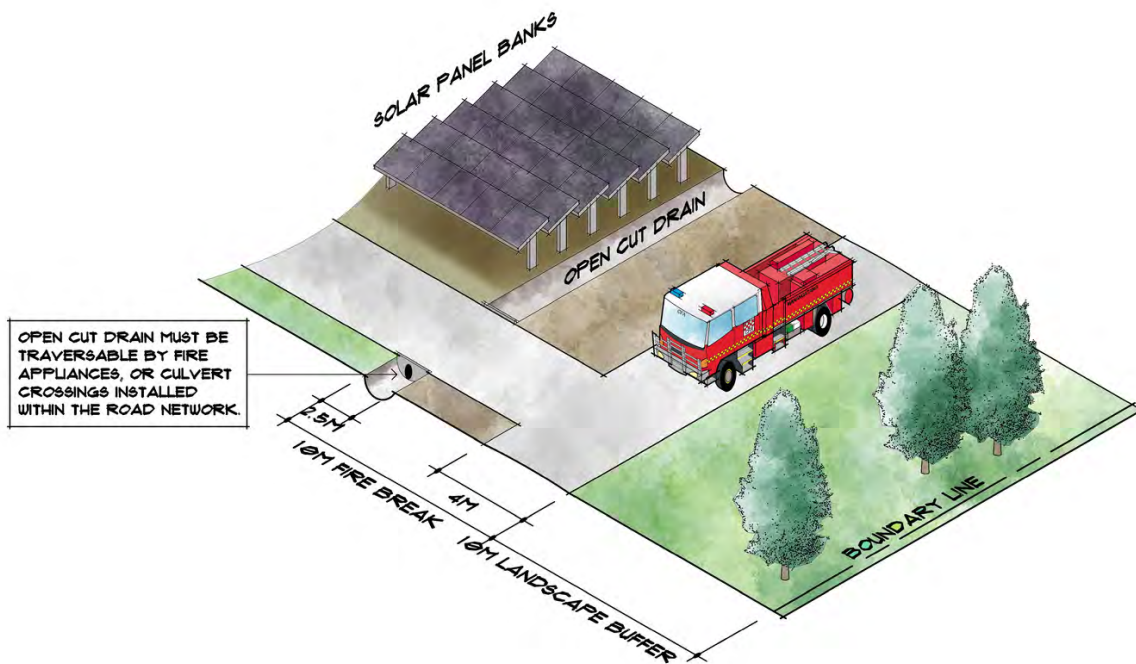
Typical cross-section indicating fire break requirements at a solar energy facility.
